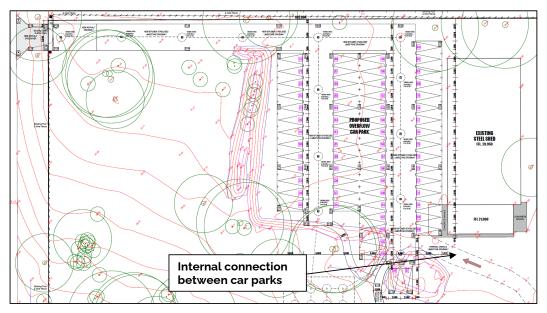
Key Dimensions of the Proposed Overflow Parking Area
